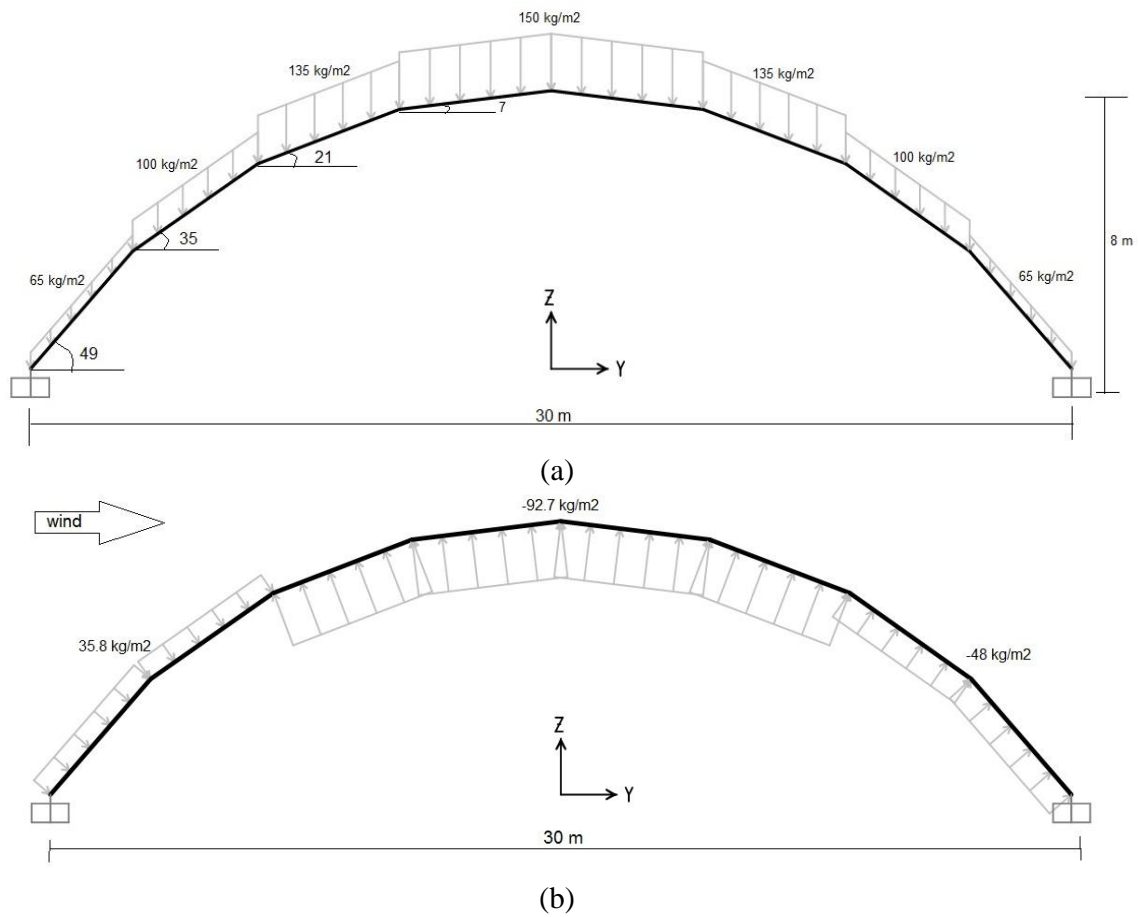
The 173-bar single layer barrel vault frame subjected to: (a) Snow loading, (b) Wind loading
